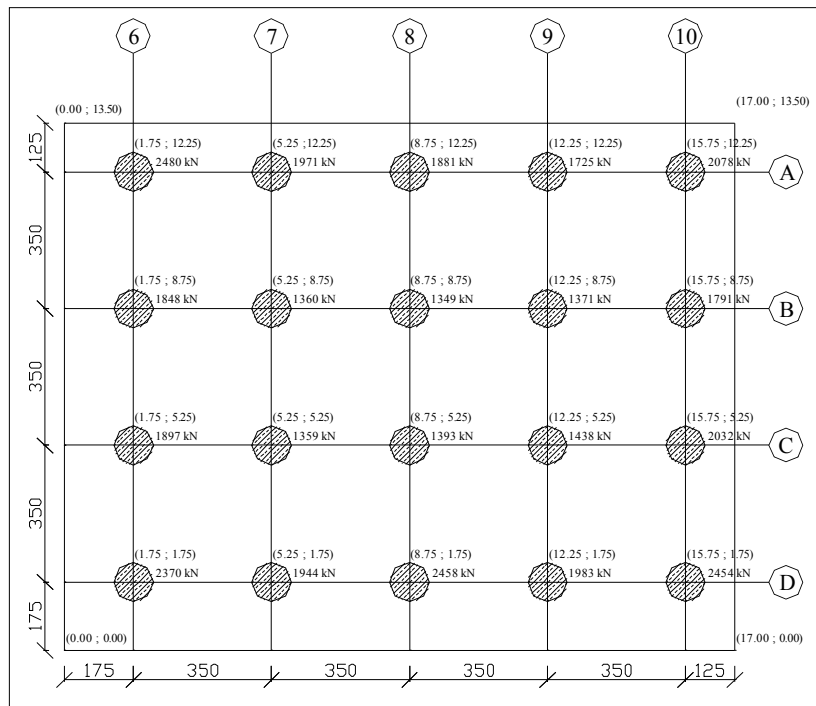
Pile disposition plan and pile loads (20 piles with 25m length)
